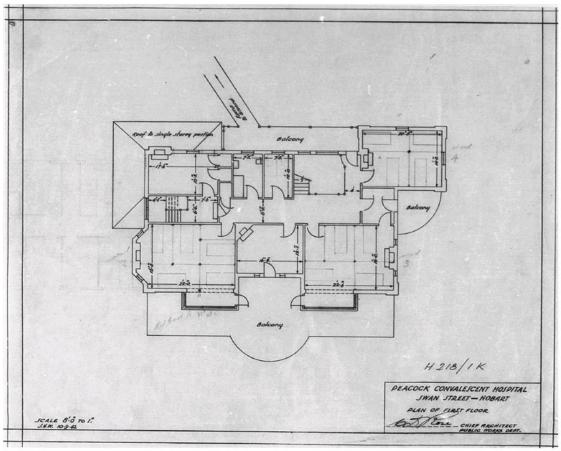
First floor plan of Ruardean, 1942. Tasmanian Archive and Heritage Office PWD266.4.43719.
